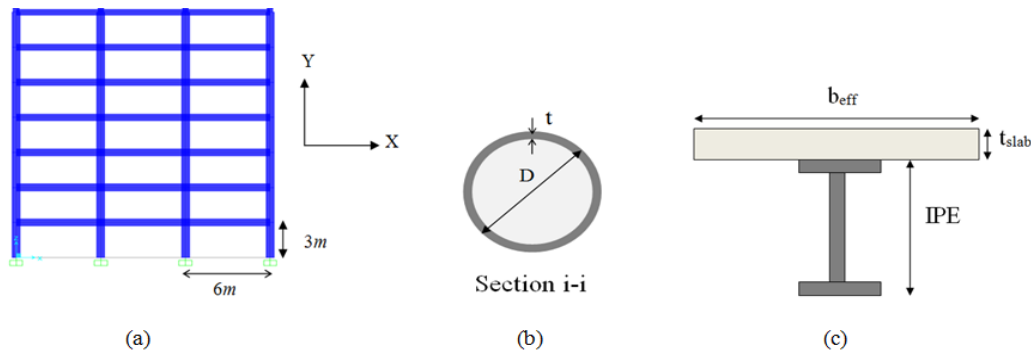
(a) A typical composite MRF, (b) circular CFT column section and (c) composite beam section (steel beam connected with concrete slab).
